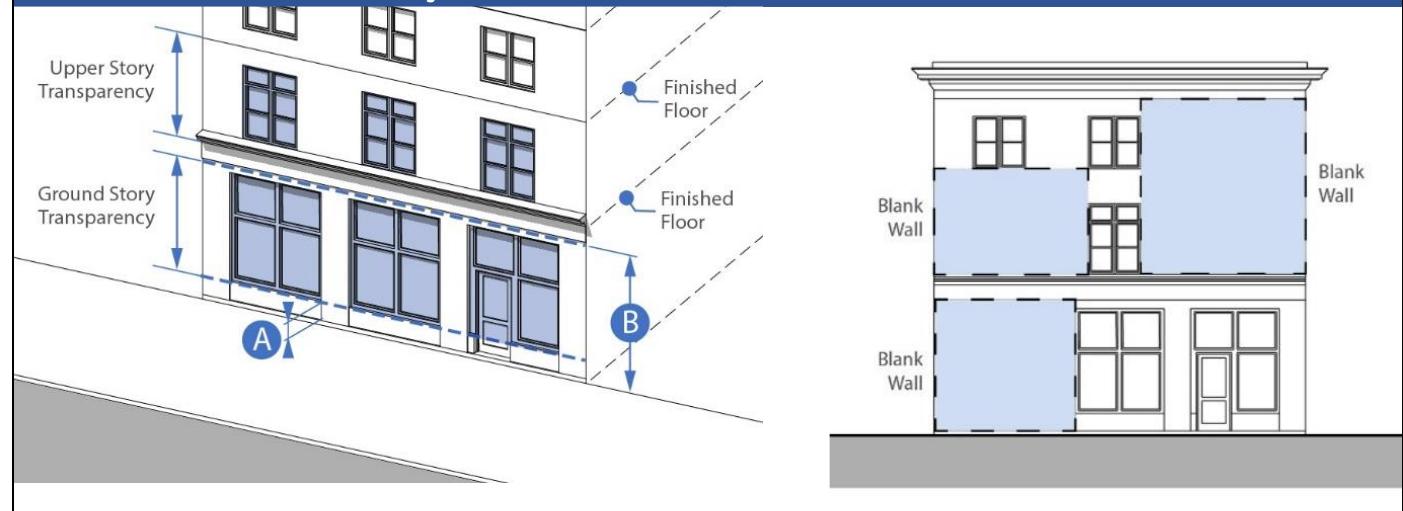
FAÇADE TRANSPARENCY AND BLANK WALL LIMITATION
